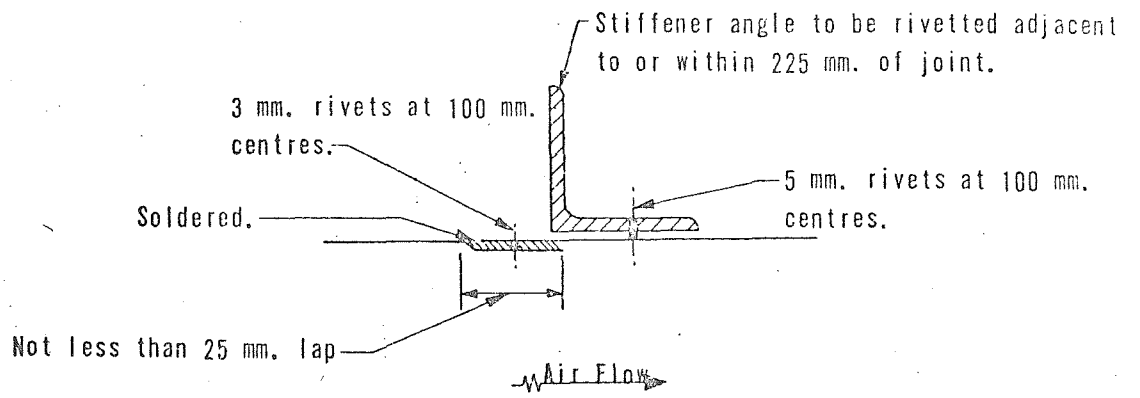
(F) LAPPED, RIVETTED, AND SOLDERED
